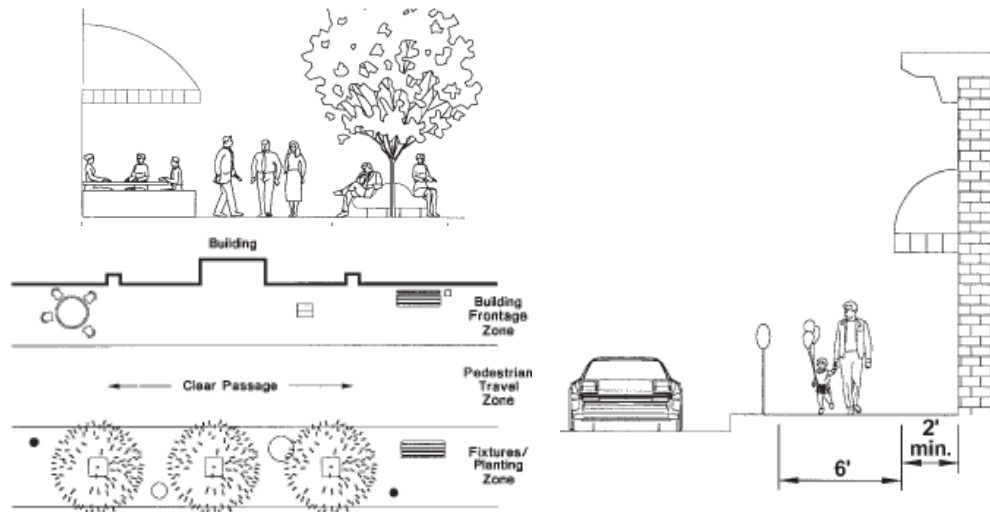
Urban streetside zones and shy distance between building and walkway (Pedestrian and Streetscape Guide, 2003: 107)
